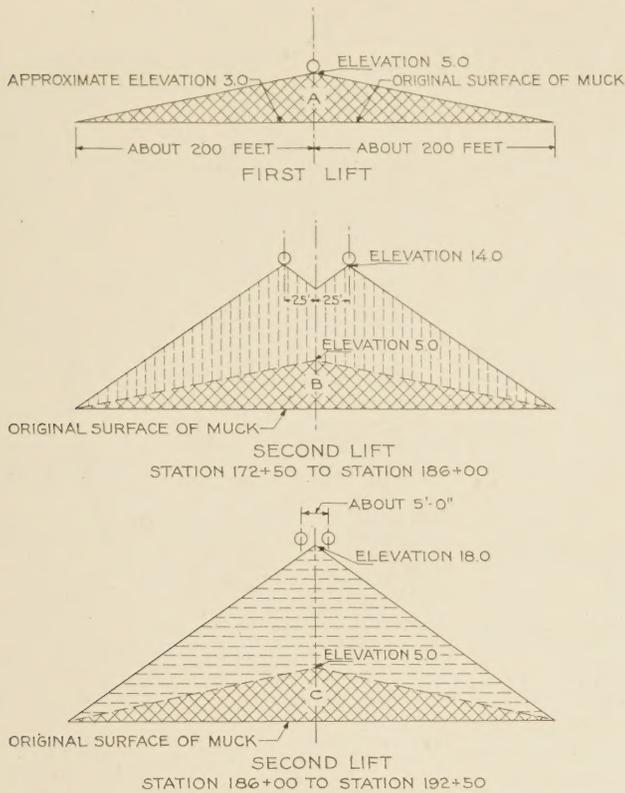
LOCATION OF PIPE LINES AT VARIOUS STAGES OF CONSTRUCTION.
